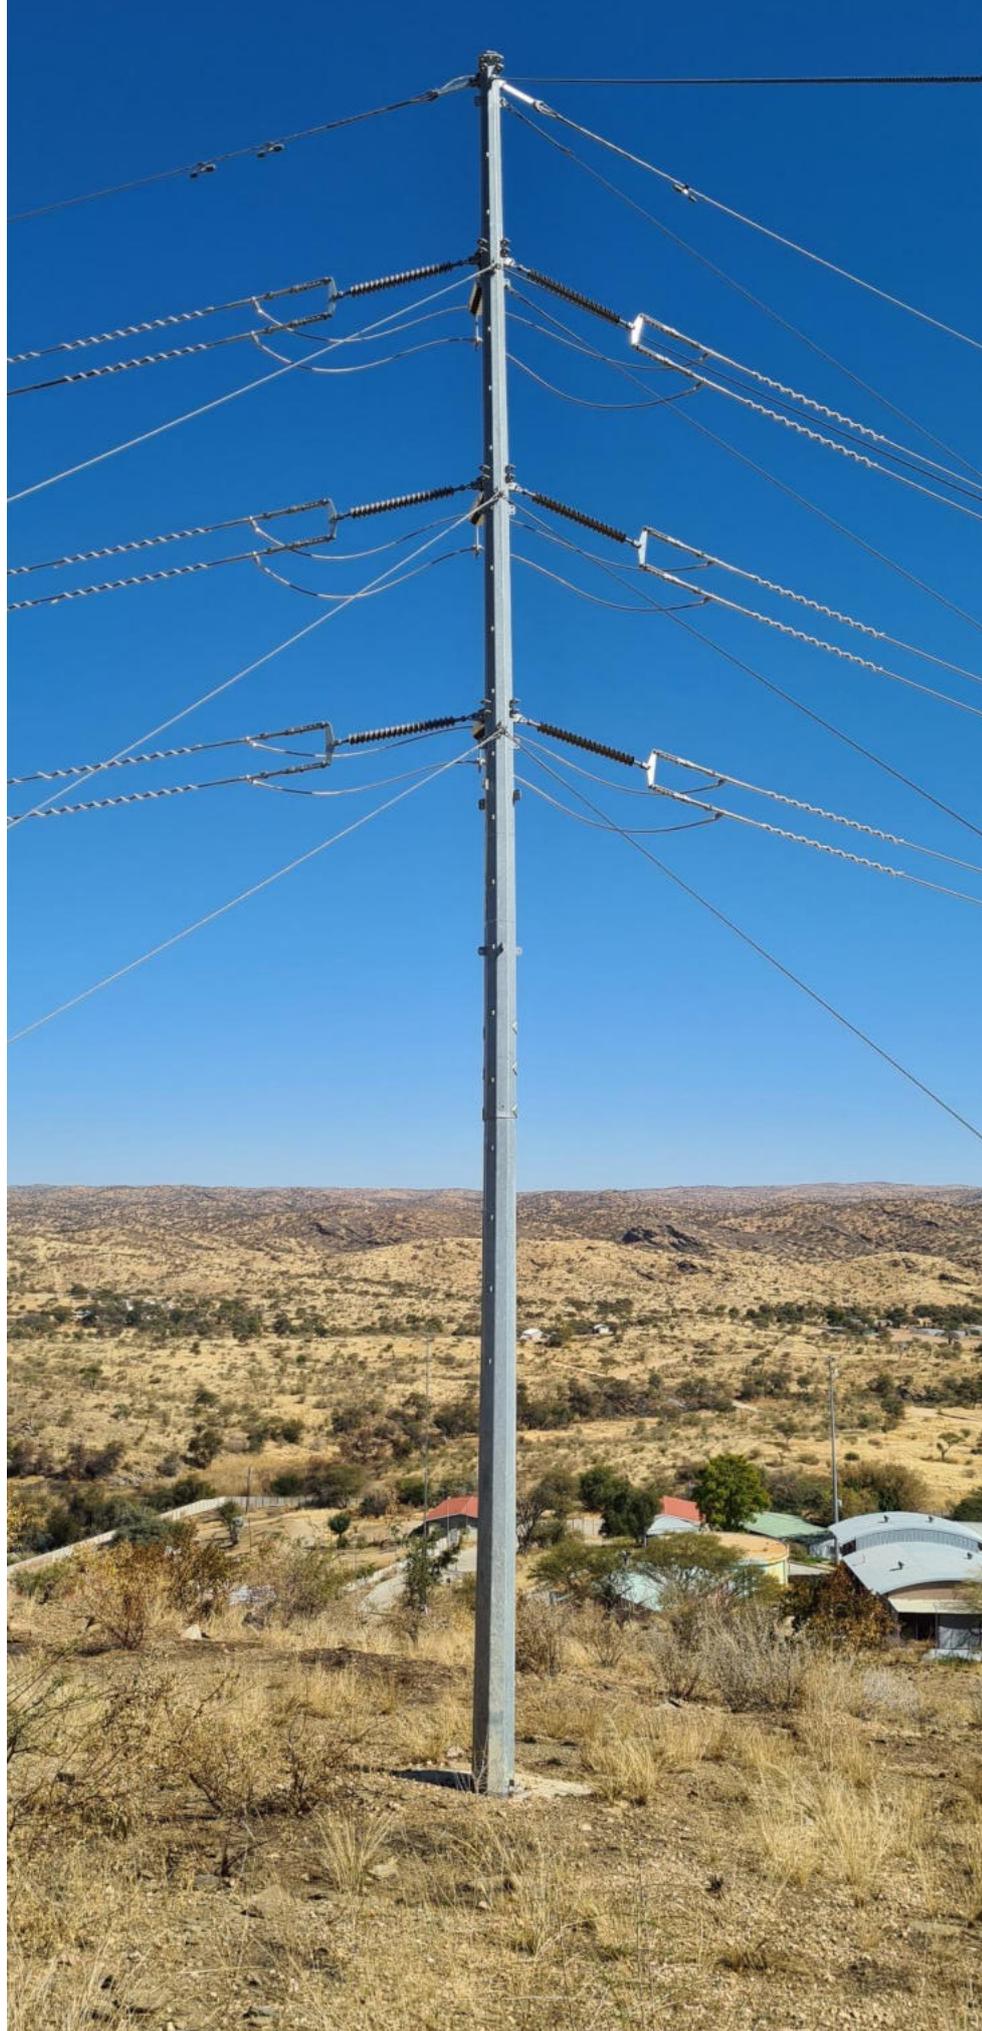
Single steel monopole illustrating of the corner / bend design option for proposed overhead powerline new and rerouted networks.
